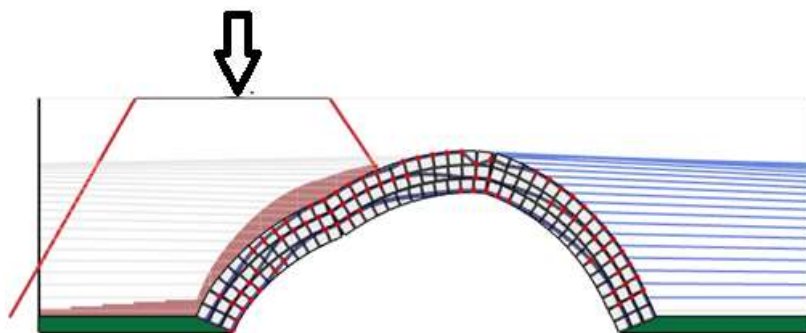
Collapse mechanism for arch loaded by 1.5 m square footing, column position at left support of arch.
